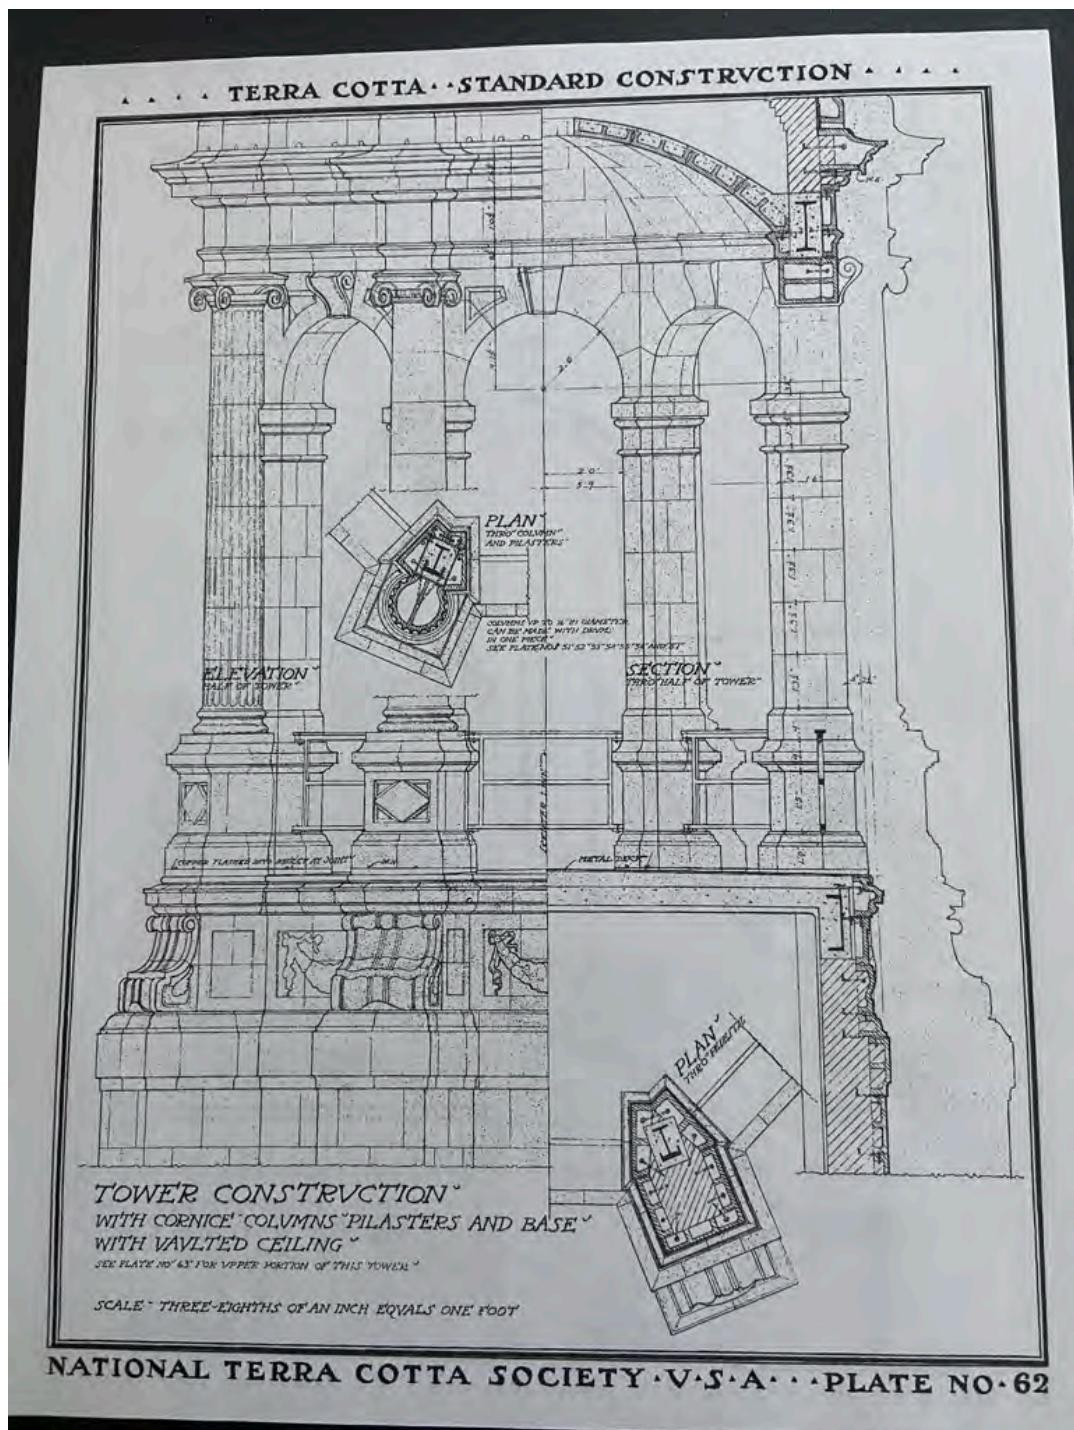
Standard detailing of joints and connections for a terra cotta clocktower similar to the one on the top of the Arlington Town Hall.
